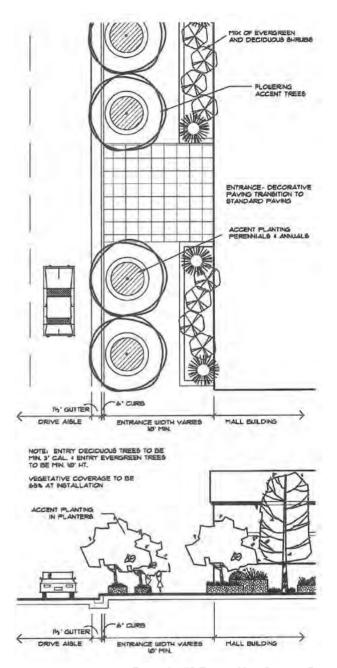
B TYPICAL MALL BUILDING ENTRY
